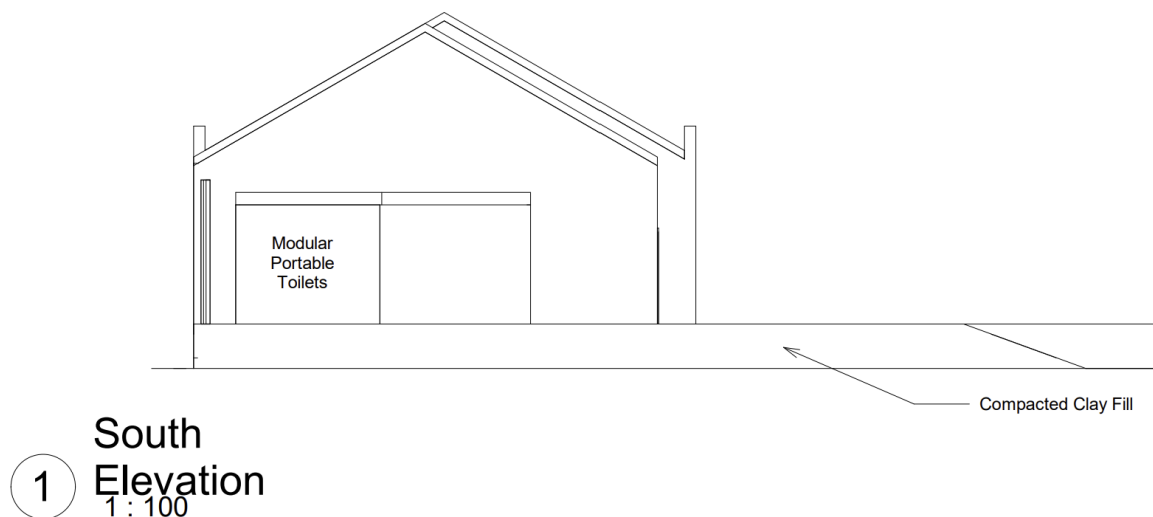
Southern Elevation, Site Plan, Source: Mitech Building Designs
